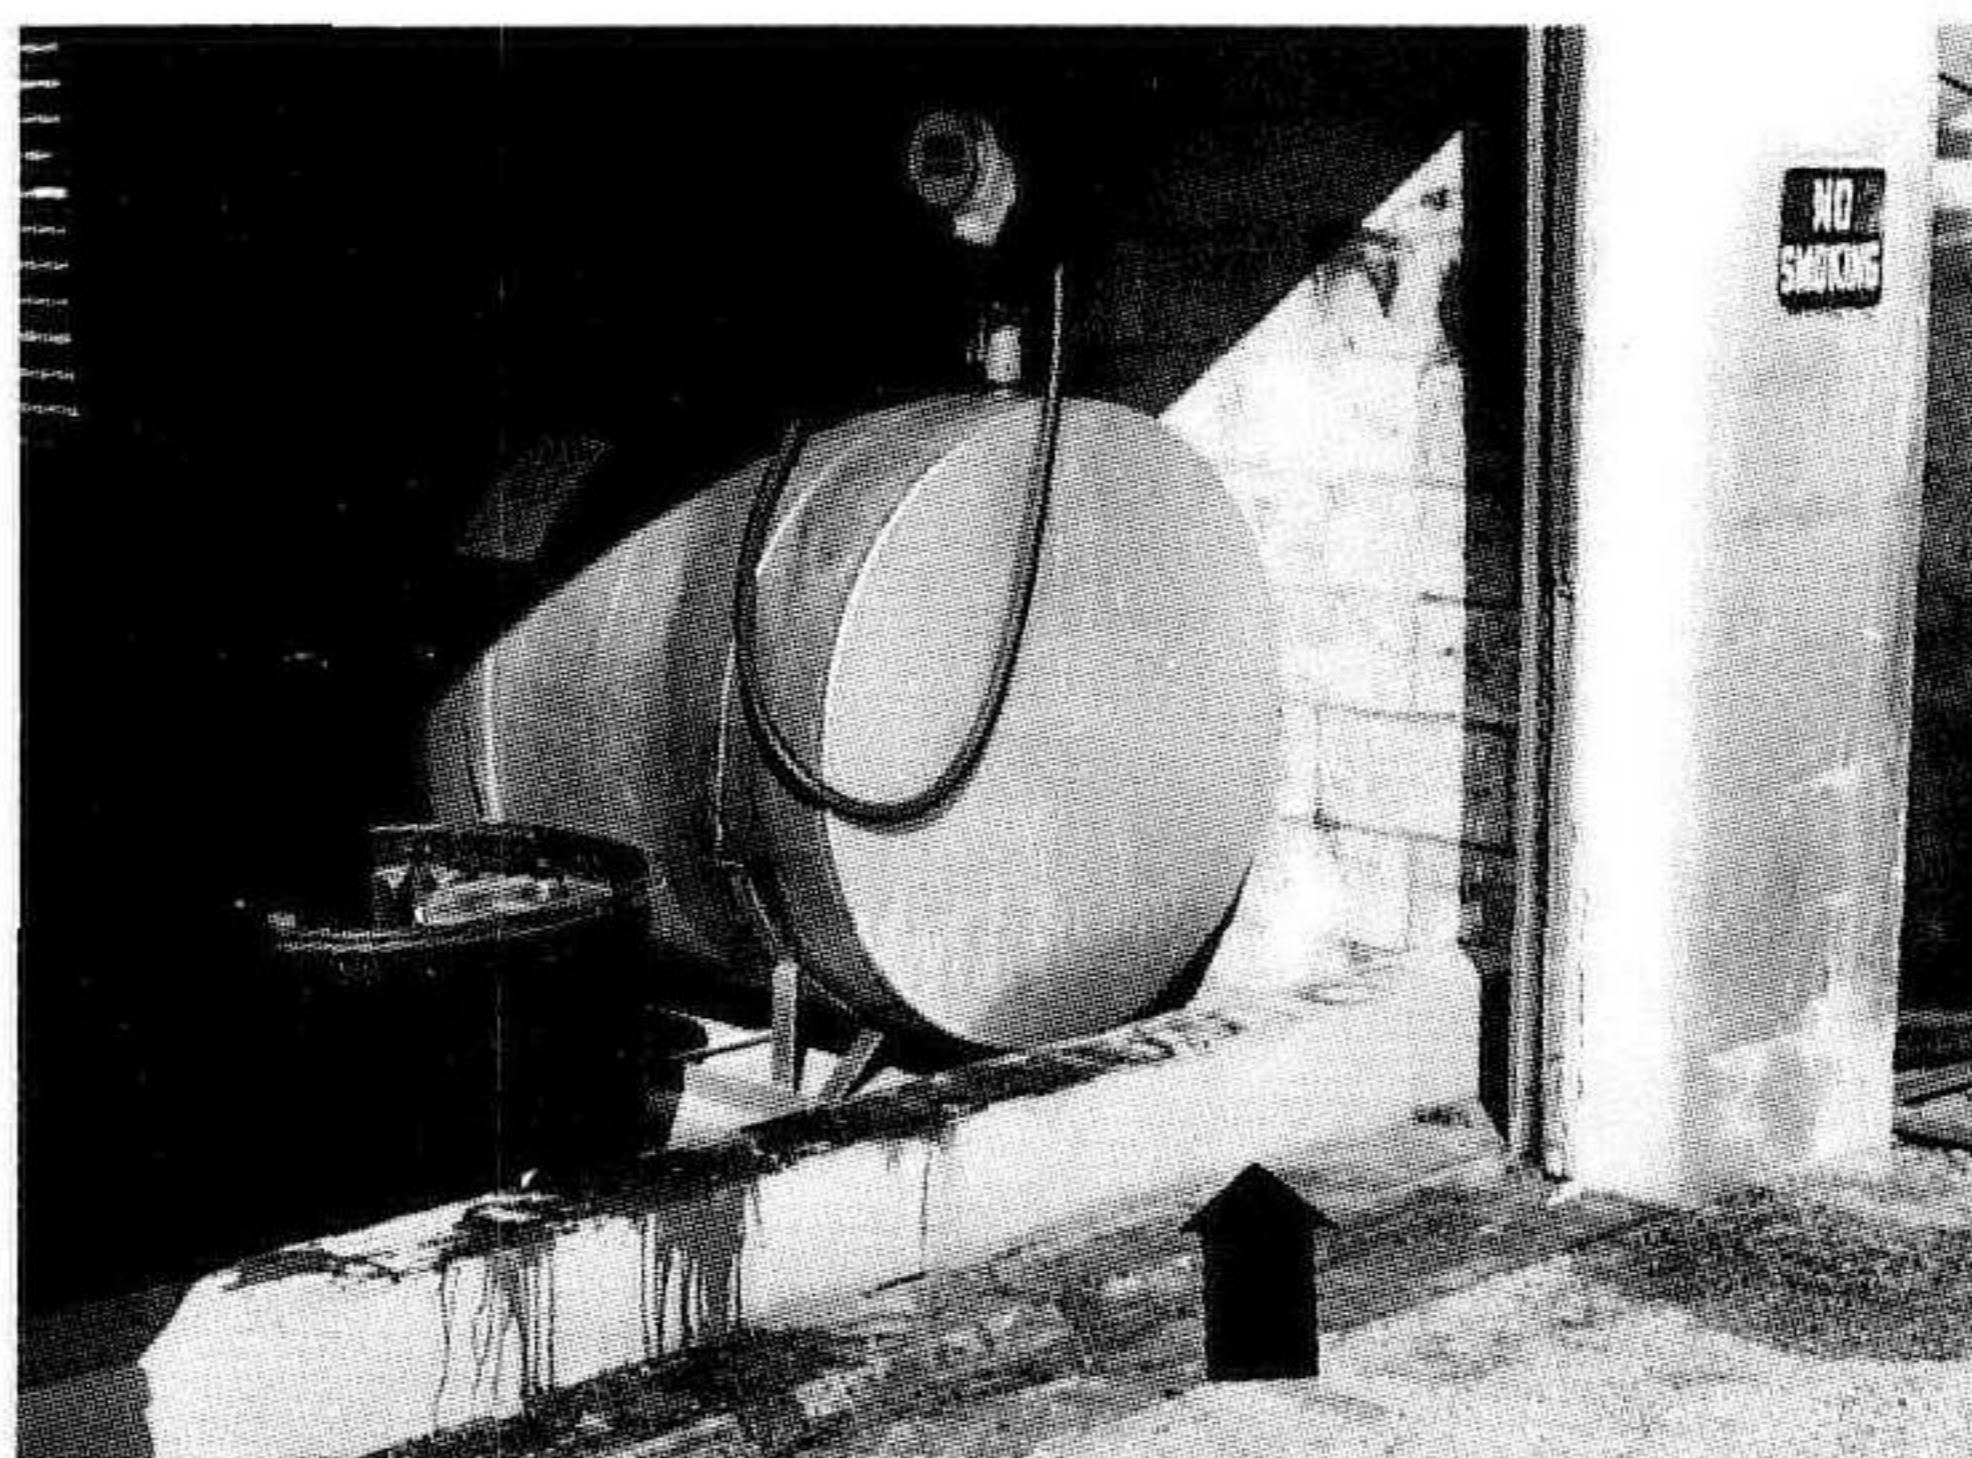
Pesticide storage building brought into regulatory compliance with the construction of a retainer wall across the opening to the building (indicated by arrow).
